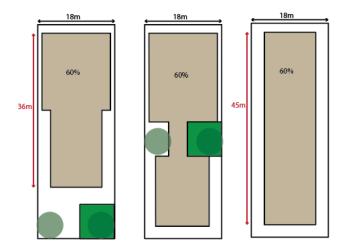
On a narrow site it is difficult to achieve 60% site coverage given other District Plan constraints.
